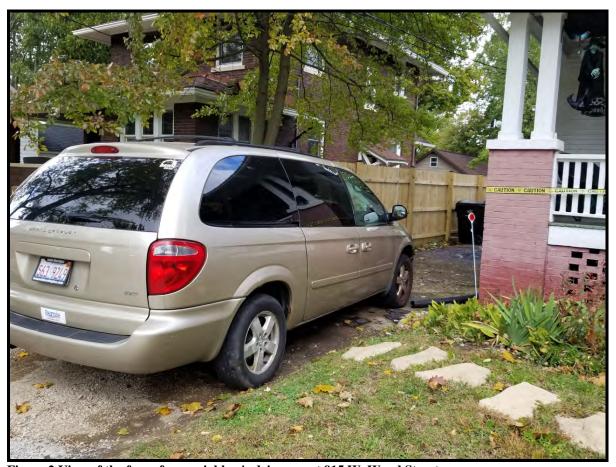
View of the fence from neighbor's driveway at 915 W. Wood Street.
